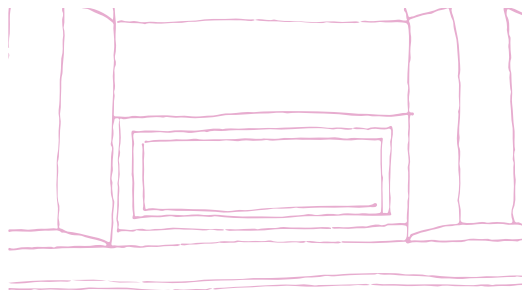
Sketch of drawings found on the ground floor (By Author)
